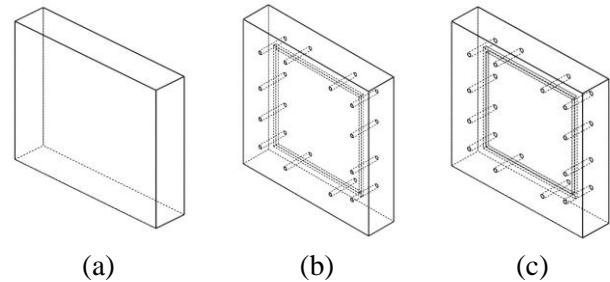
The concrete and reinforcement concrete models, (a) CW-(b) CW10-(c) CW12
